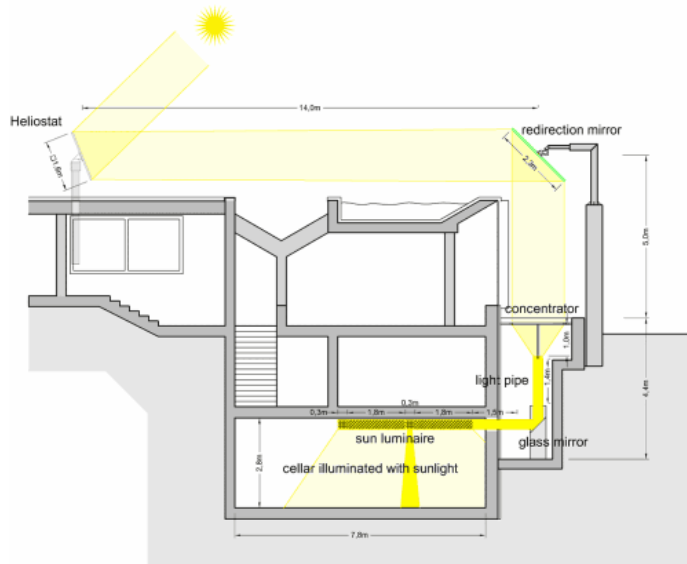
Schematic cross-section of the pilot installation at Bartenbach LichtLabor.
